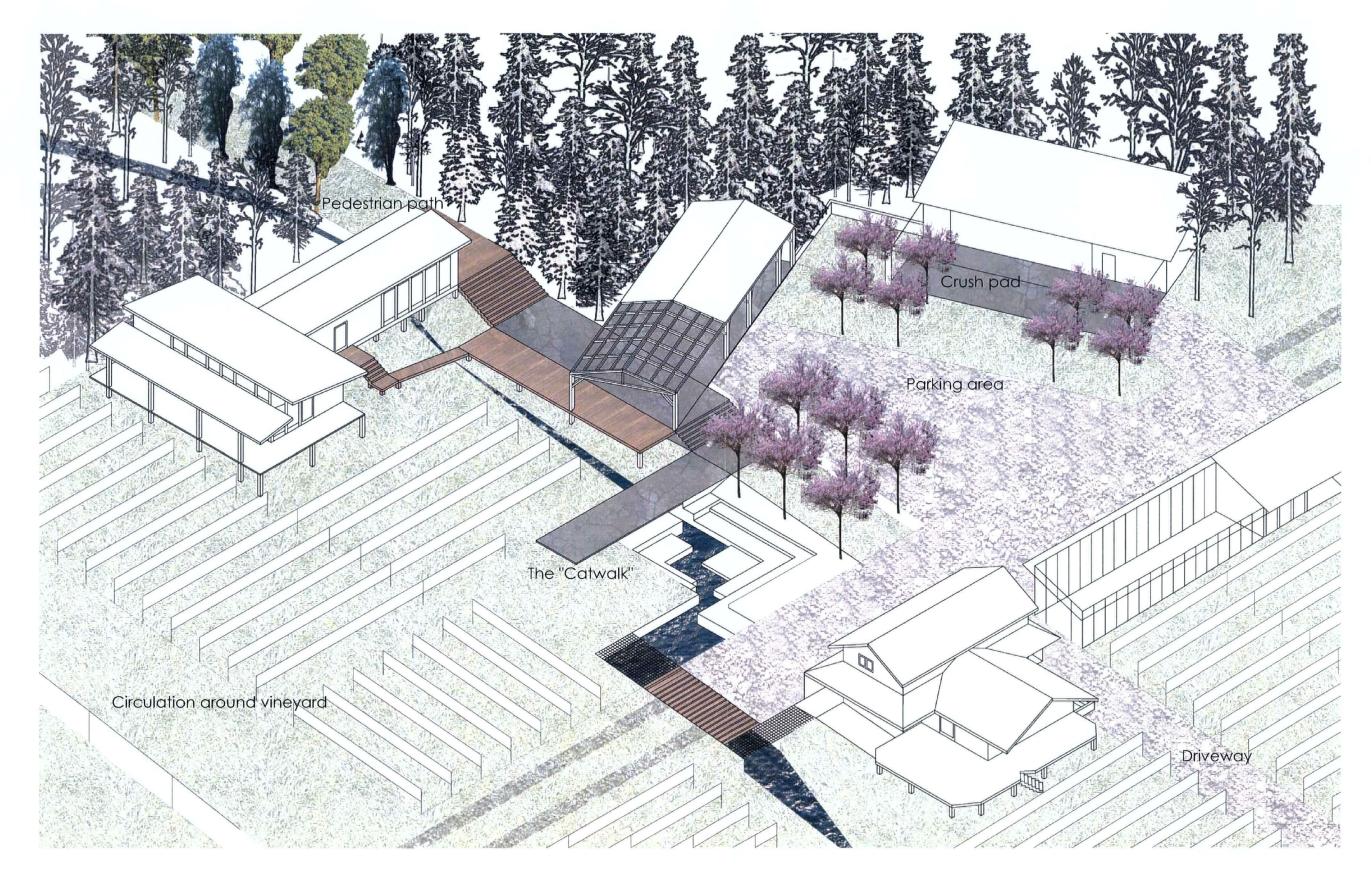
Crushyard axonometric drawing, orientation towards north-west Not to scale
